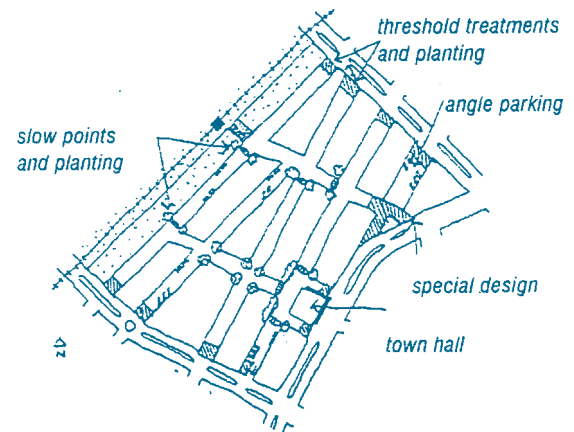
Detail of traffic calming and streetscape work in the Town Hall Precinct, Port Melbourne.
